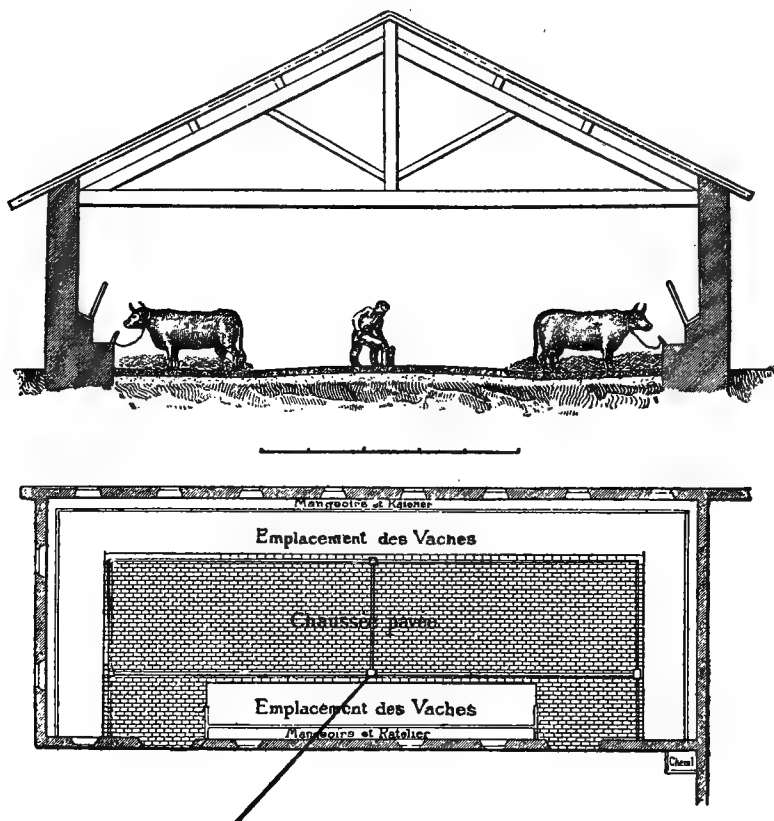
Section and plan of stable for 64 cows at Ferme d'Arcy.
